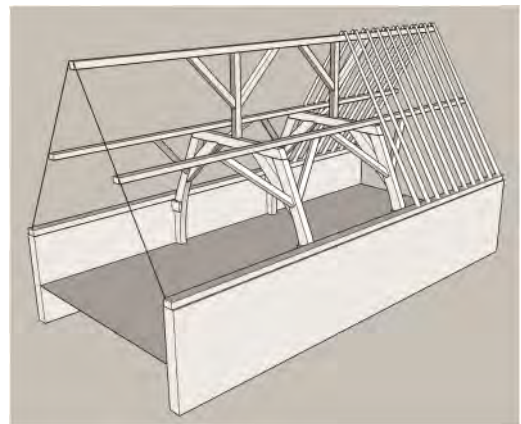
Traditional roof structure with stacked composite trusses. Leiden, Nieuwsteeg 17, 1592 (ELO, E.D. Orsel).
